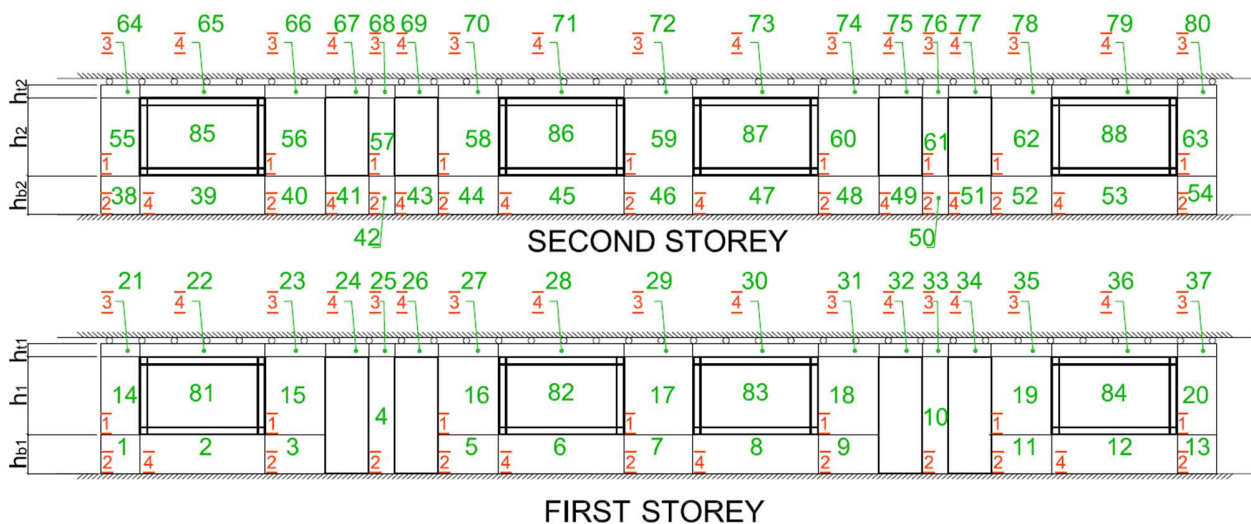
17 Discretization of Bearing Walls in the Retrofitted Situation
